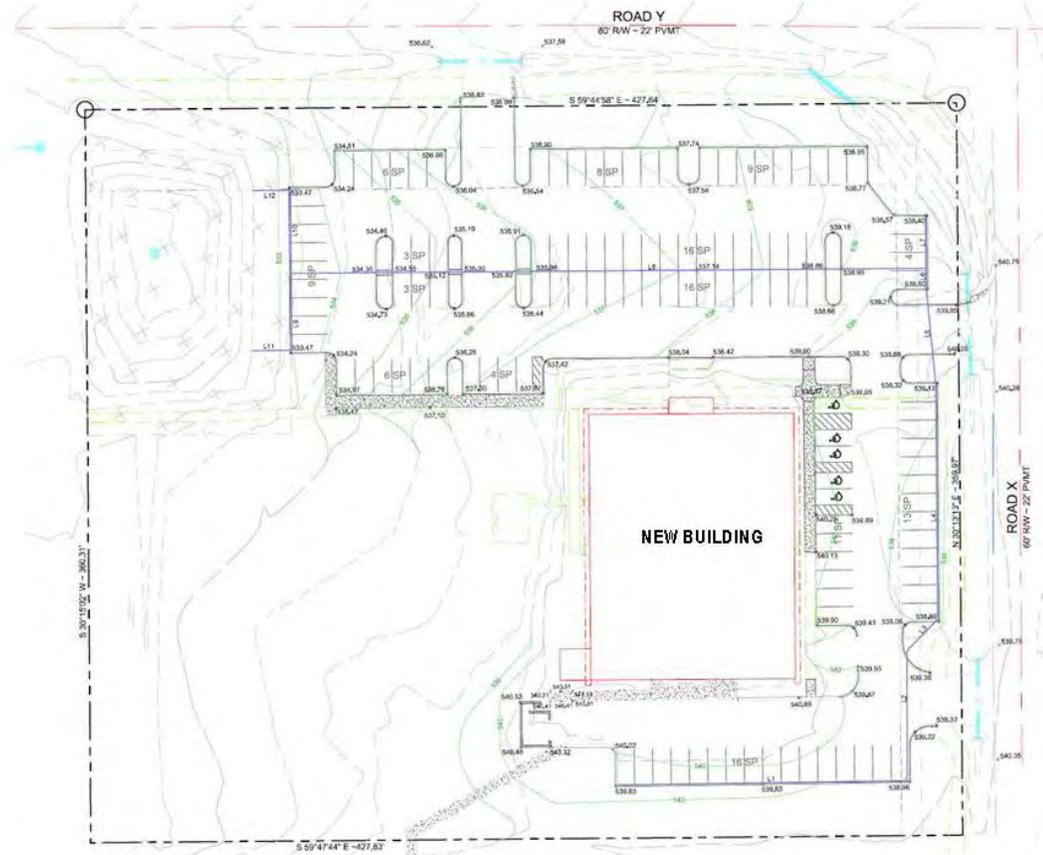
18 Sand Filter Design Example Site Plan.
